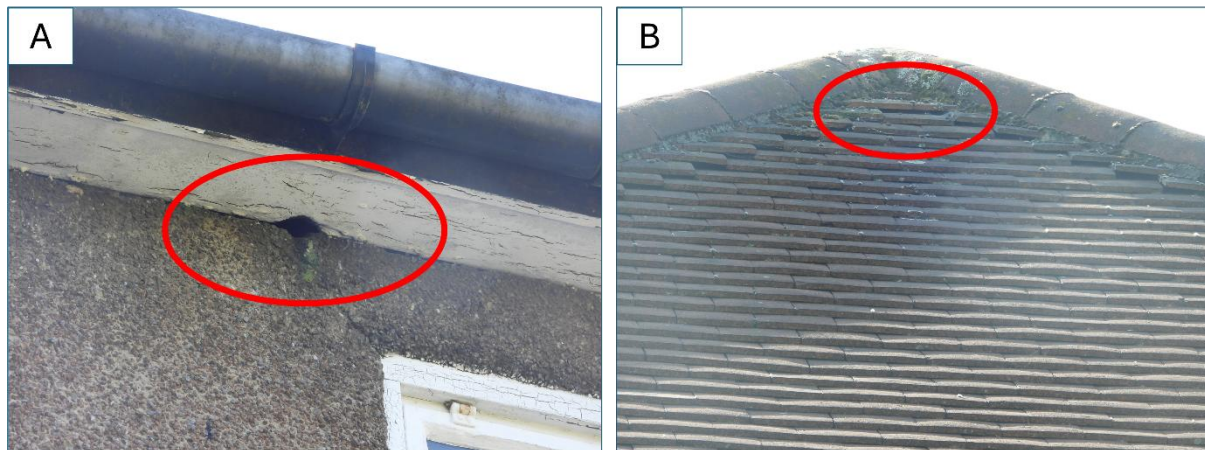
PRFs noted on the northern façade included a gap in the soffit and gaps between roof tiles.
